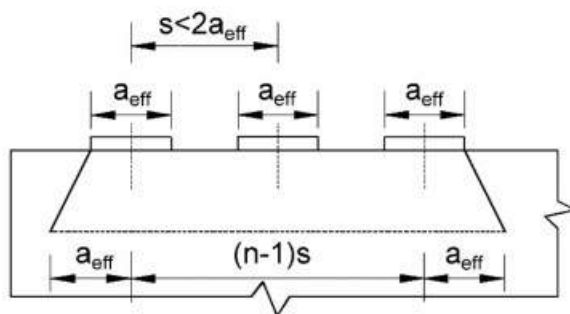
Closely Spaced Multiple Anchorages
